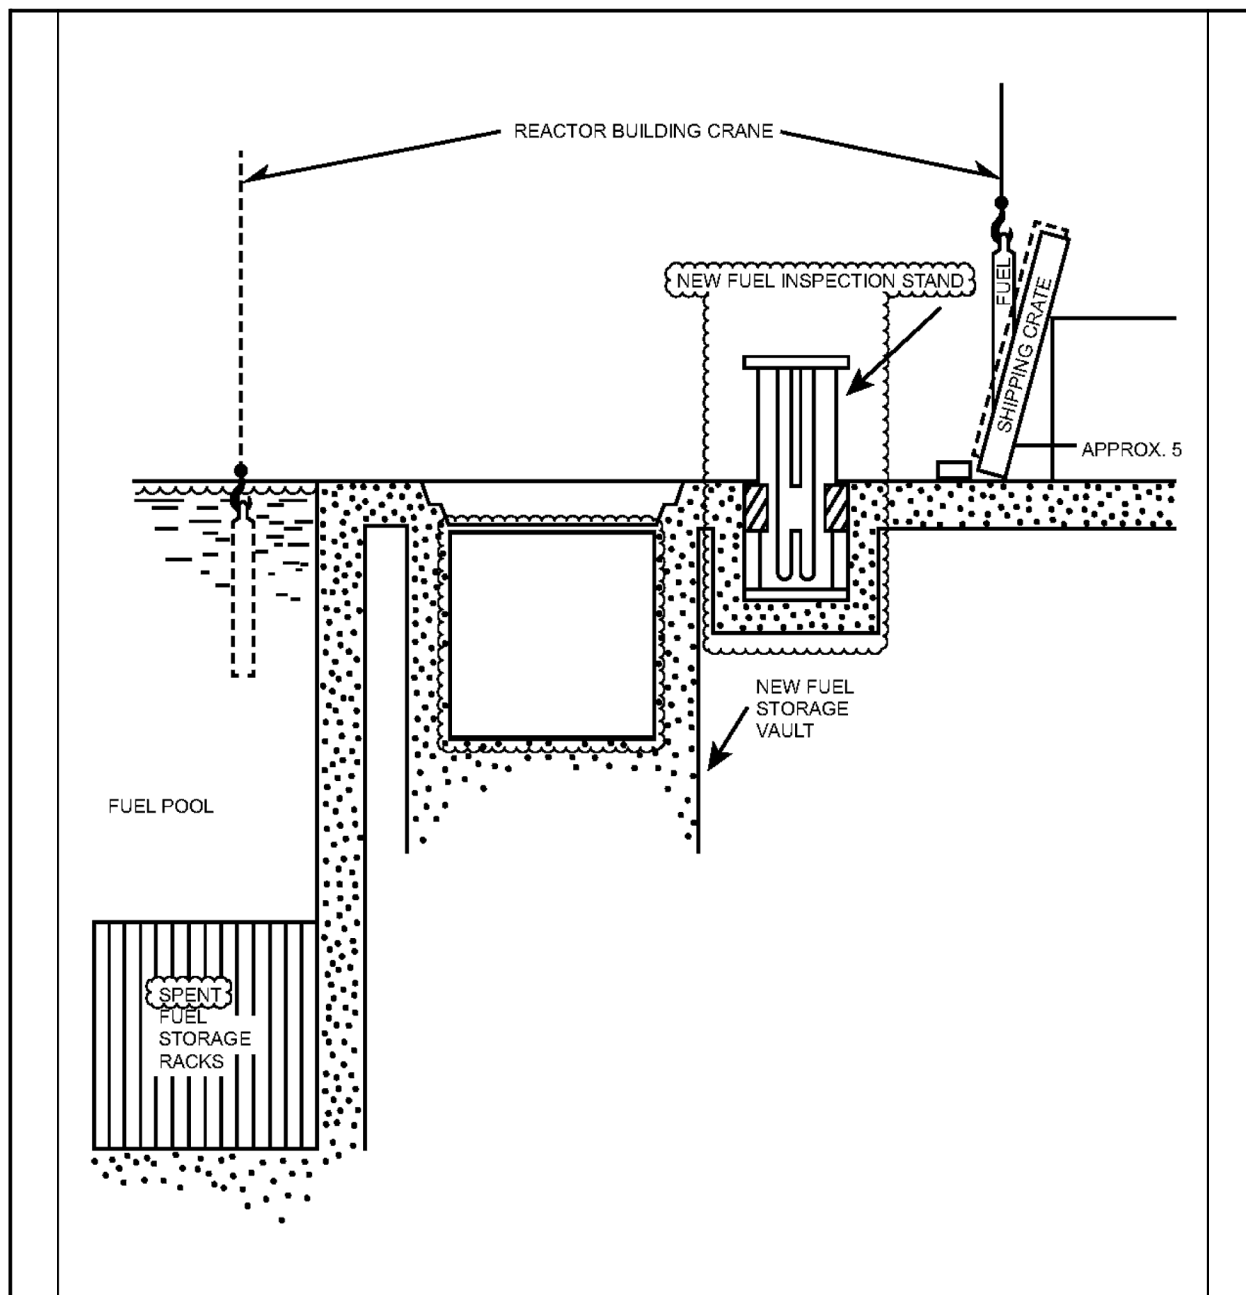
Simplified Section of New-Fuel Handling Facilities
